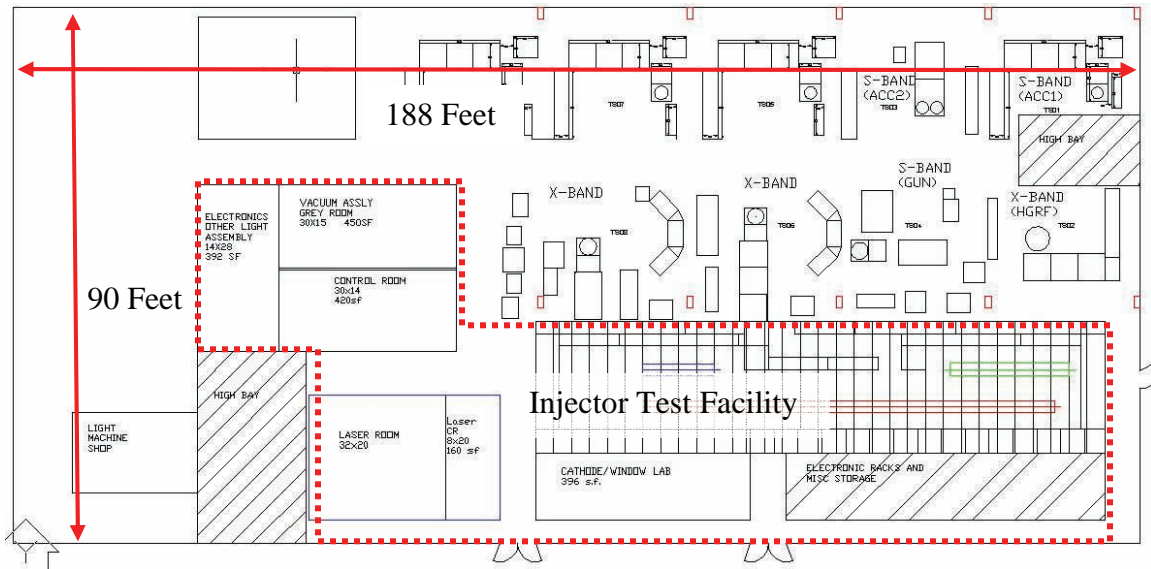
Possible siting of the ITF at the Klystron Test Lab (building 44). Removal of offices in the southeast corner of the building to make way for the expansion of the ASTA enclosure is required. The laser room is an expansion of an existing structure.
